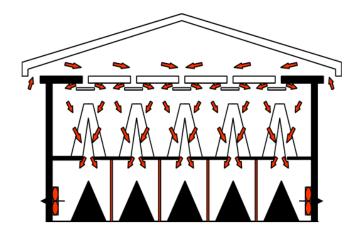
Cross section (a) of a high rise (HR) layer house. The ground floor is for manure storage and the hens are housed on the first floor. Source: Xin (2010, Personal Communication).
